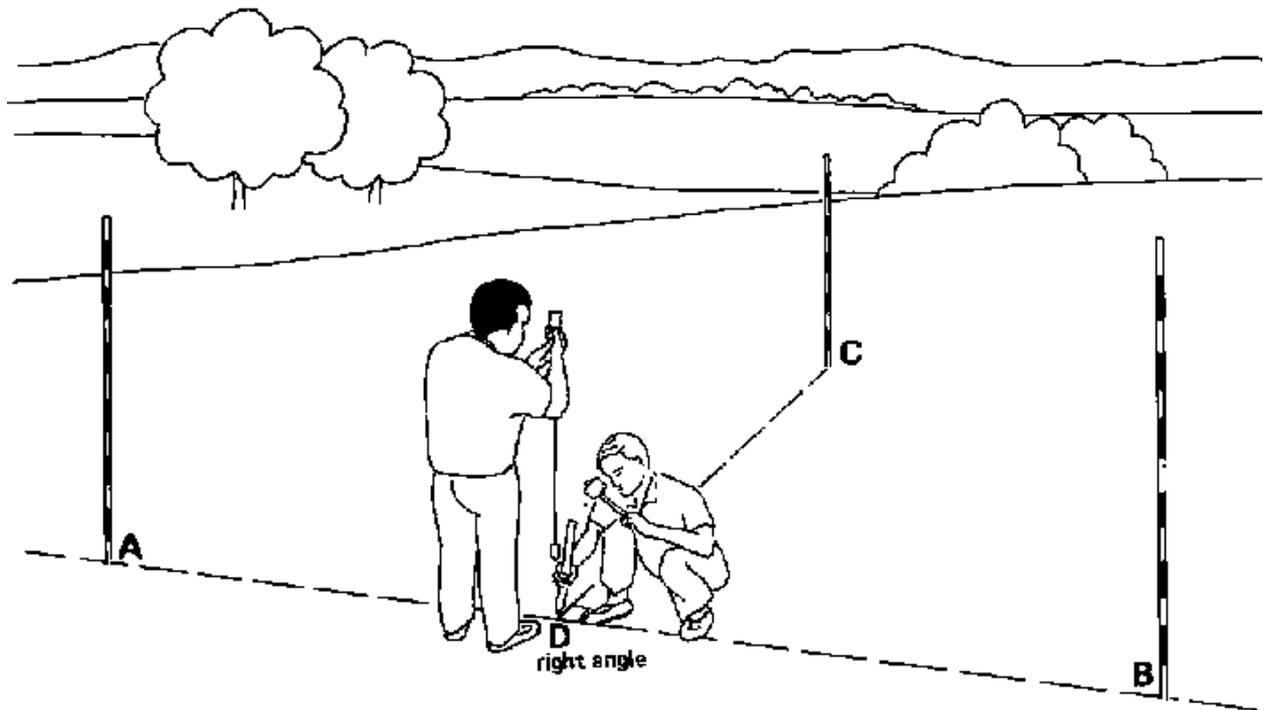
Setting out a perpendicular line, Step 2](#)
